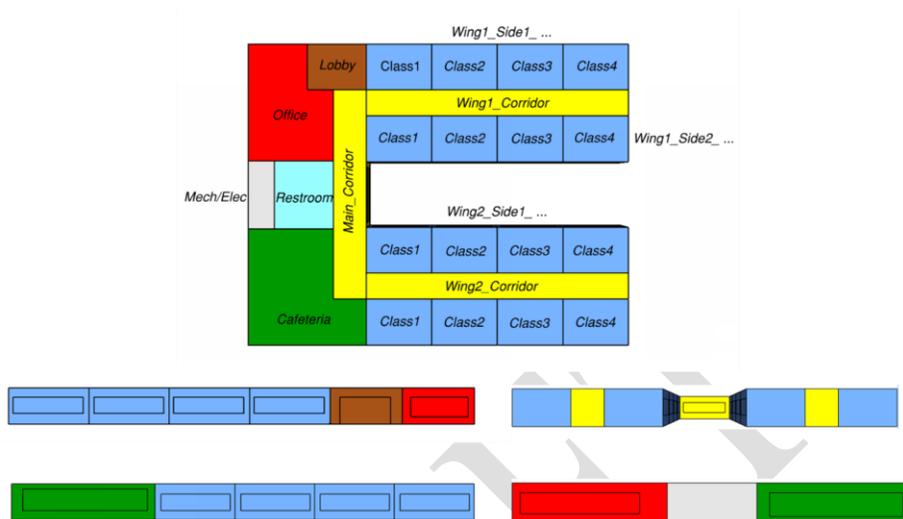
Floor Plan and Elevation Views of Small School Prototype
